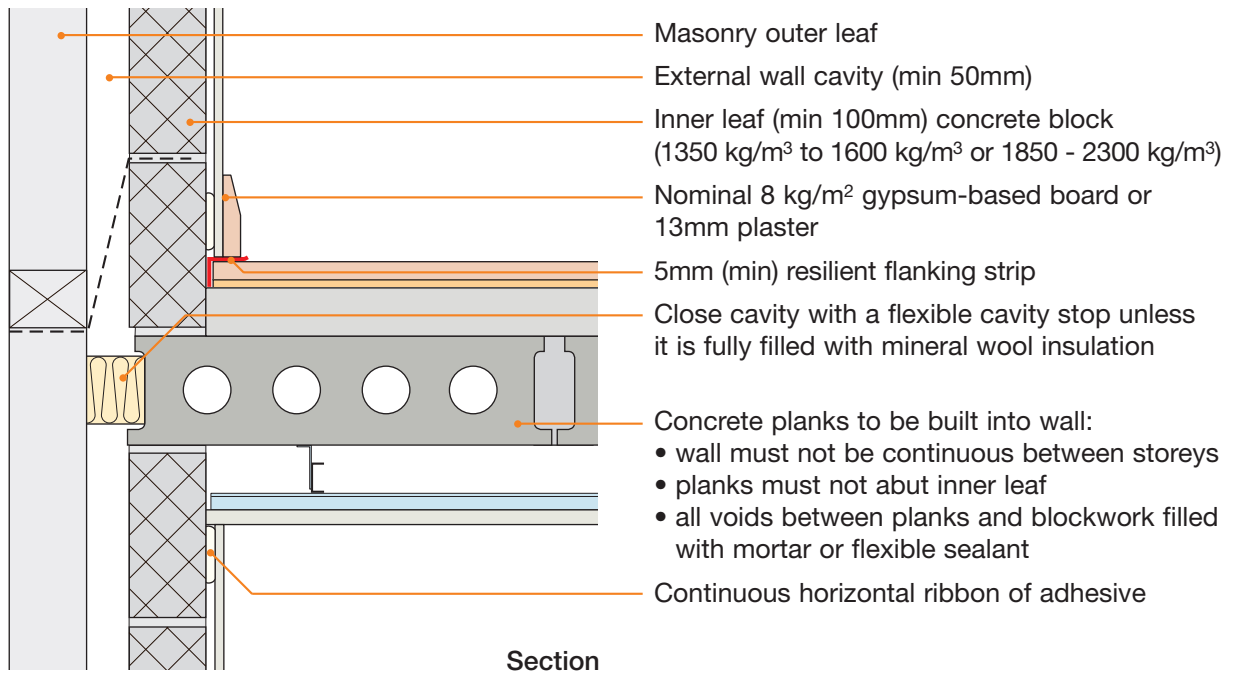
type floating floor treatment and CT1 type ceiling treatment
